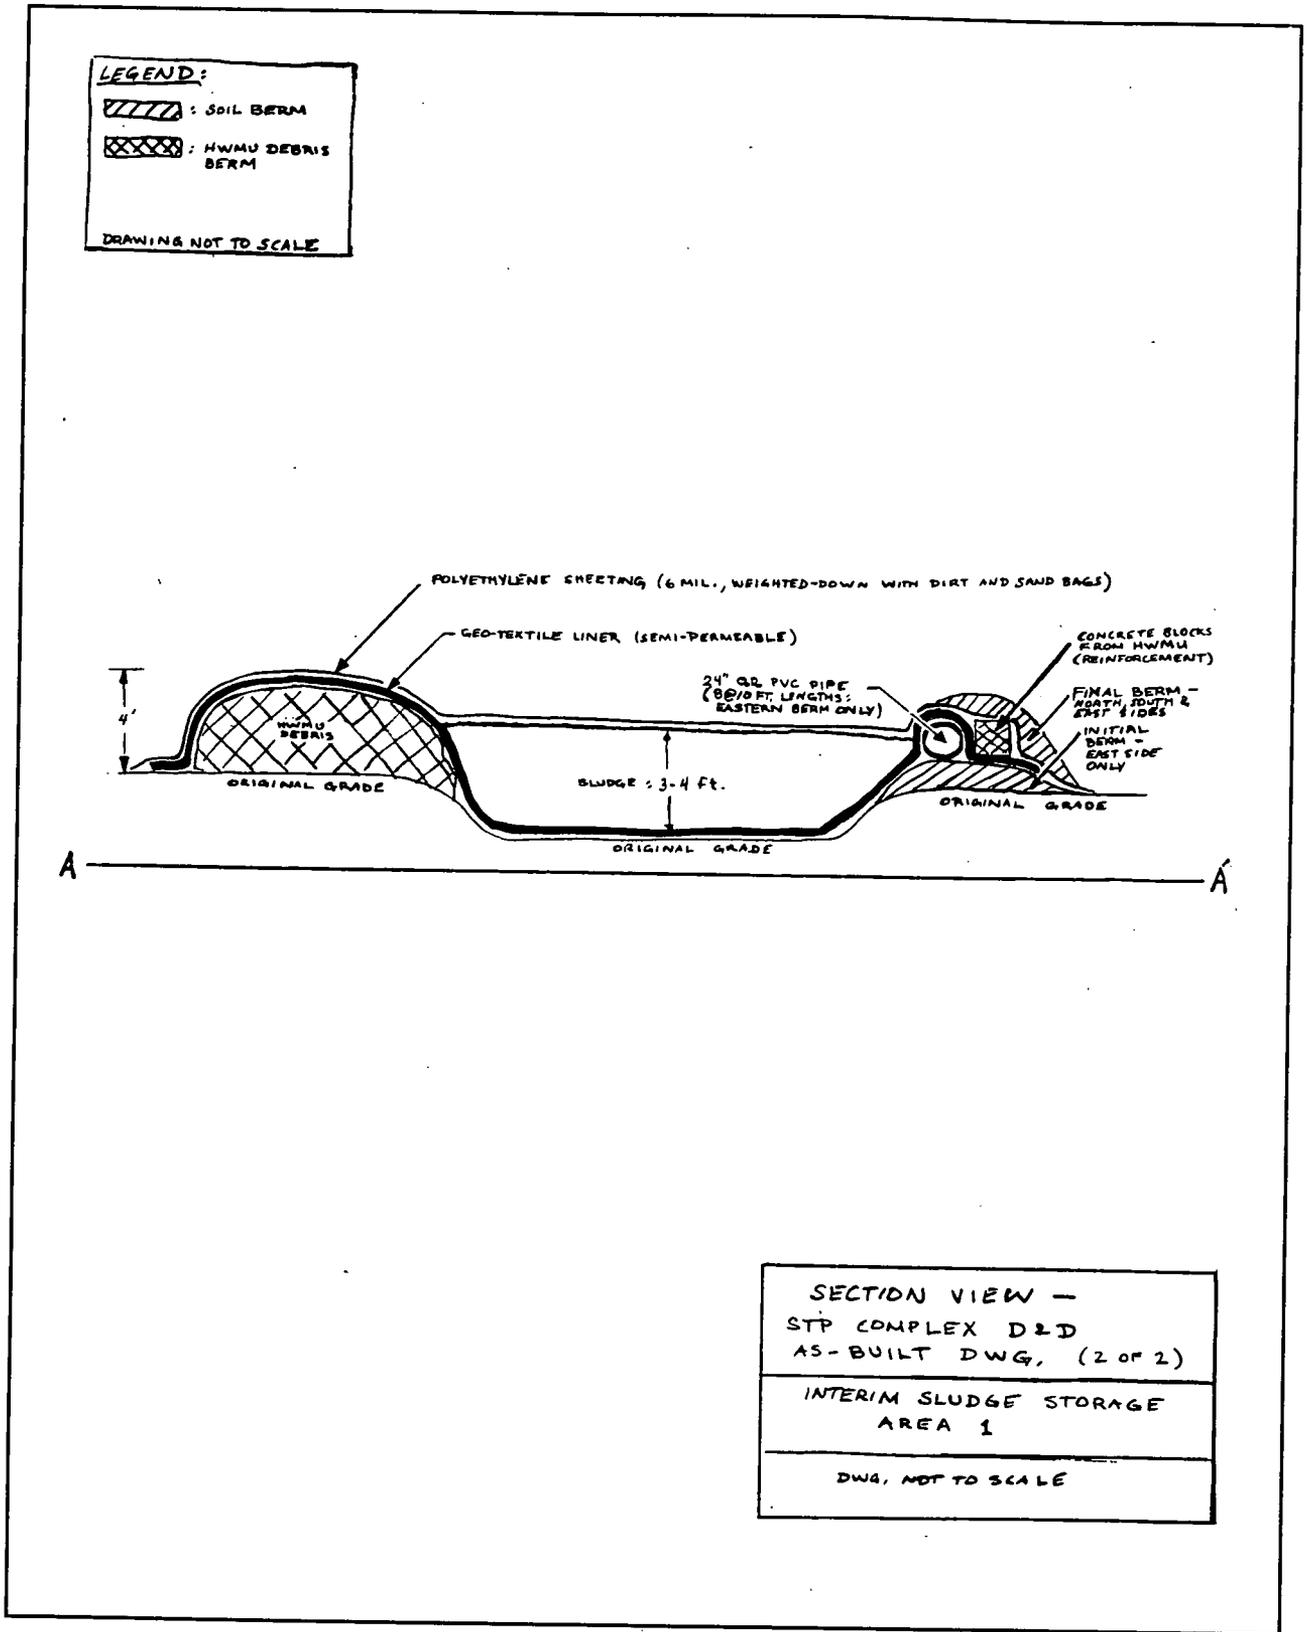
Interim Sludge Storage Area 1 Section View
